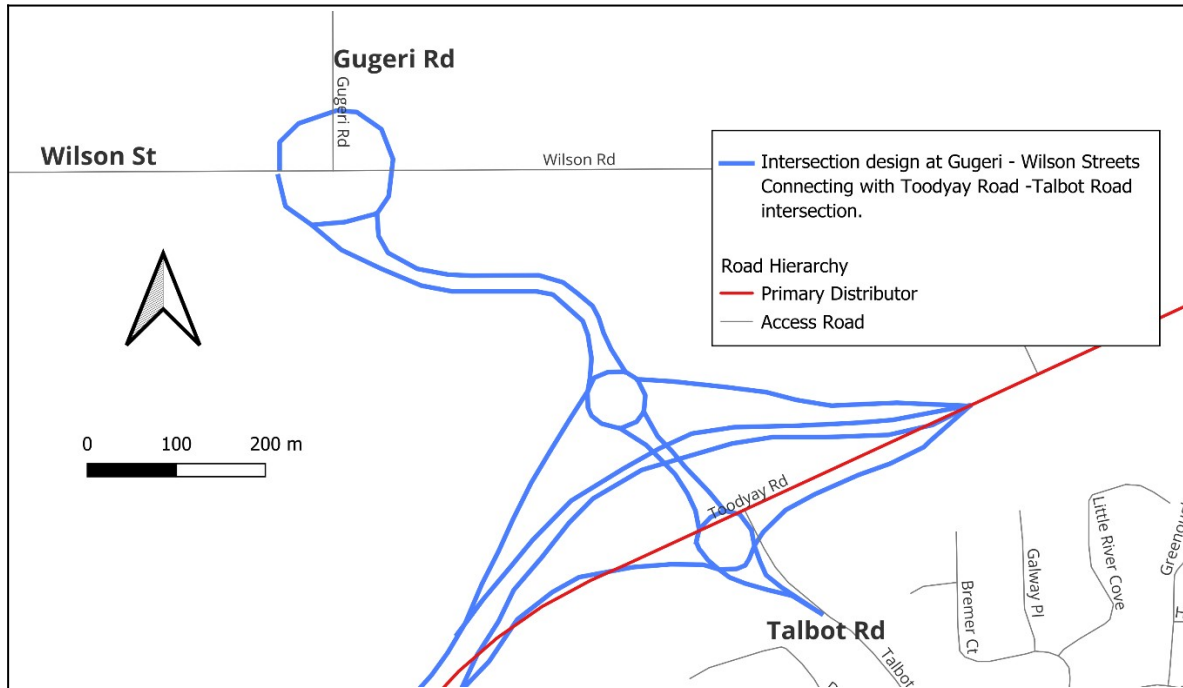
Design roads from Talbot Rd to the Gugeri Road Wilson Street intersection as was found on OpenStreetMap.
